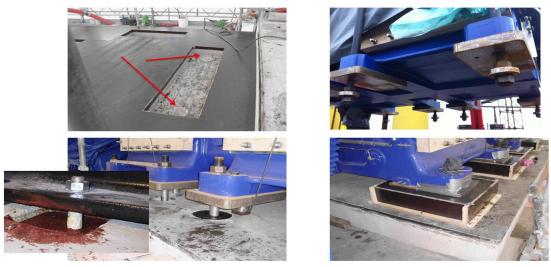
Procedure for a post-installed anchor bolt installation (Source: Apoltec)
